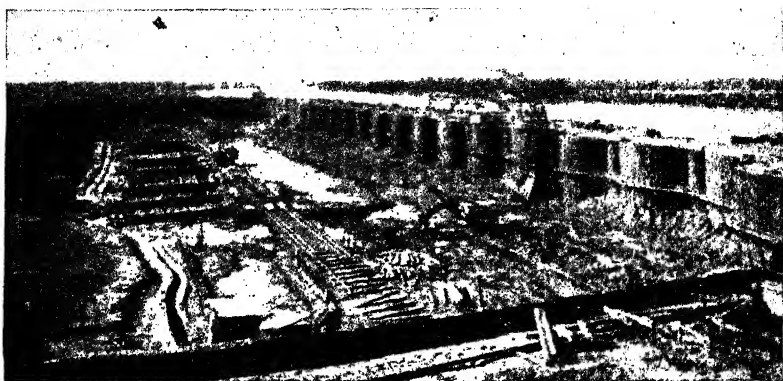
Cofferdam for lock construction at Pickwick Landing Dam.
